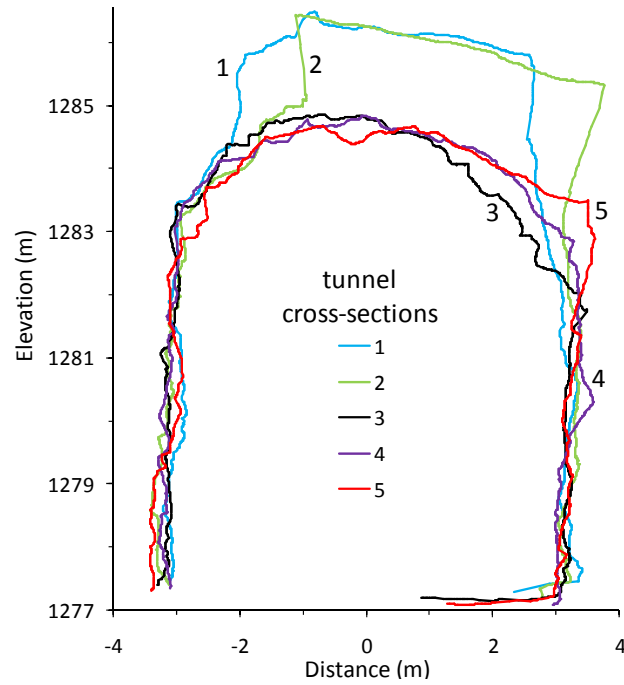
Tunnel cross-sections (profiles 1 and 2 are located where a large rock fall occurred)
